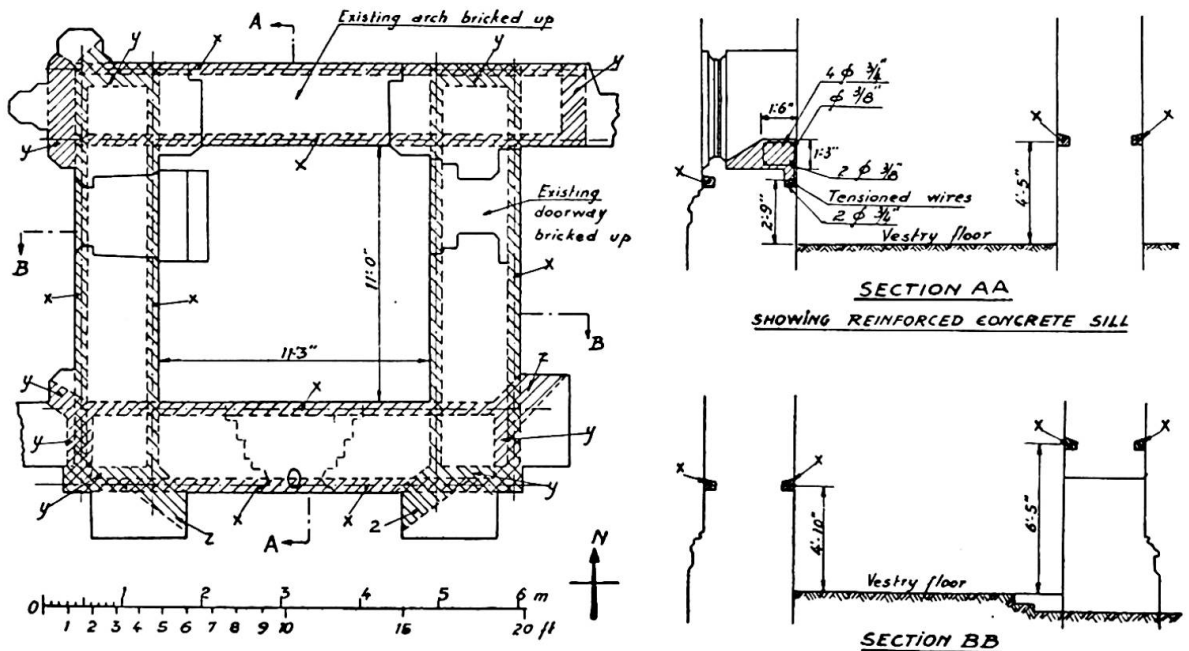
Plan and vertical section of the church tower to be strengthened.
